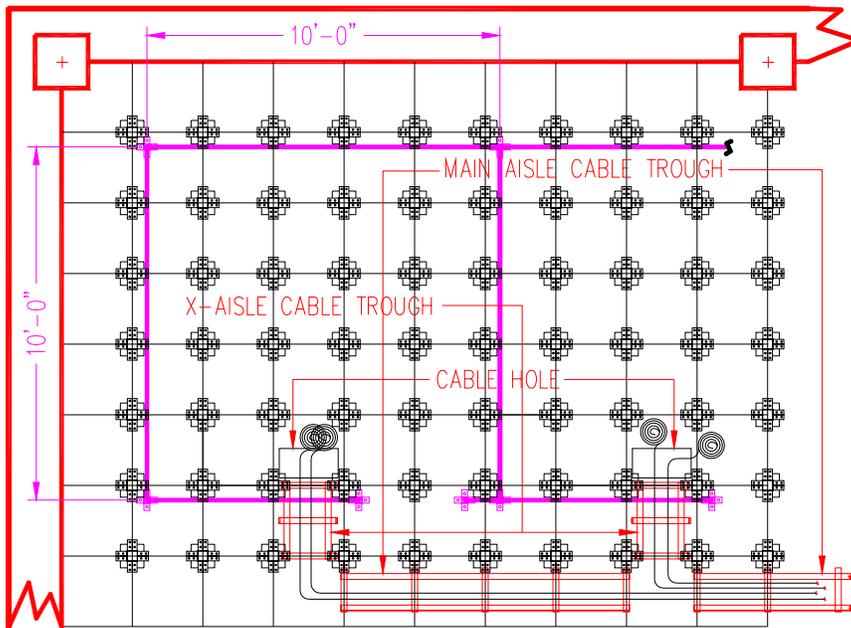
TYPICAL RF CAGED COLLOCATION COILED CABLE BENEATH FLOOR TILE
